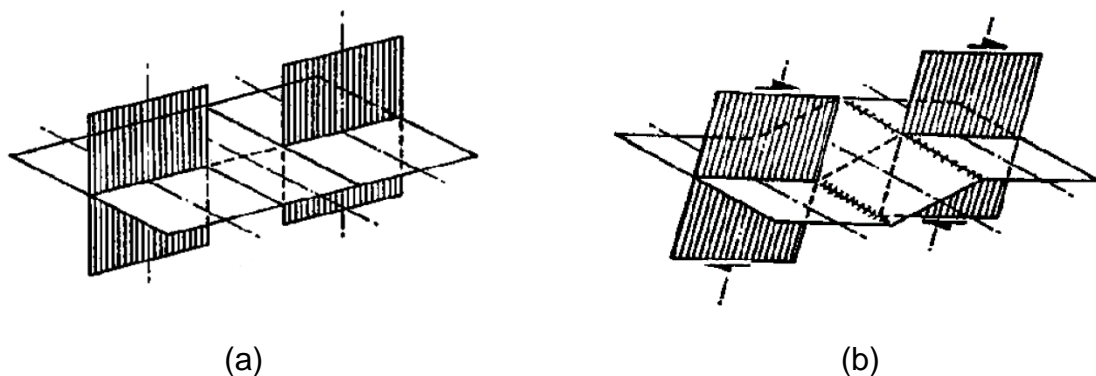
(a) Coupling of walls solely by slabs; (b) developed yield lines under horizontal loading [26]
